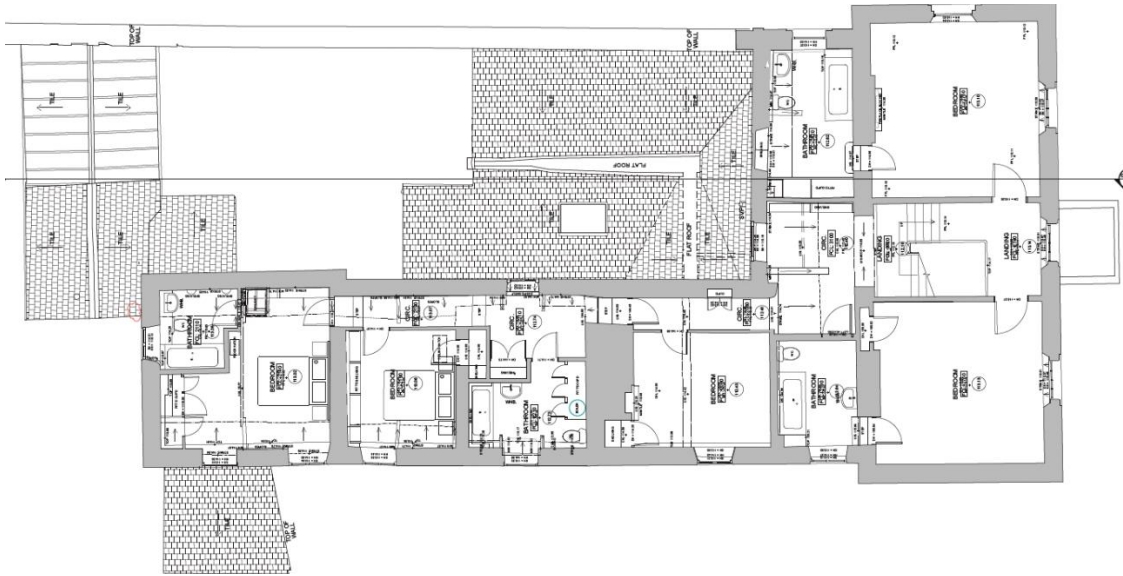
Existing First Floor (Concept Eight Architects, 2023)
